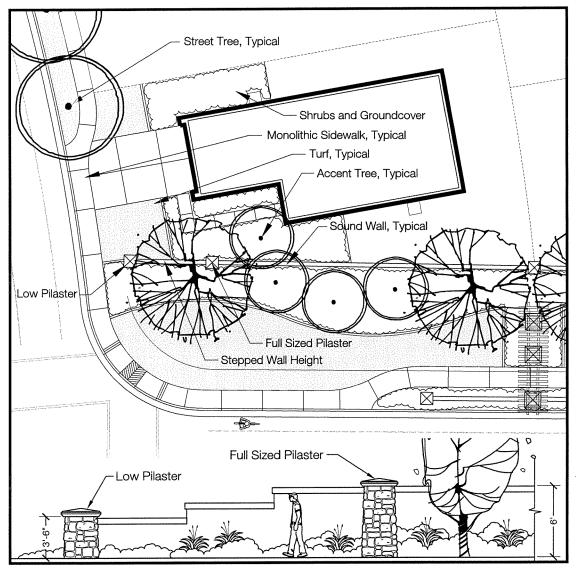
Soundwall and Pilaster Diagram, Plan & Section
